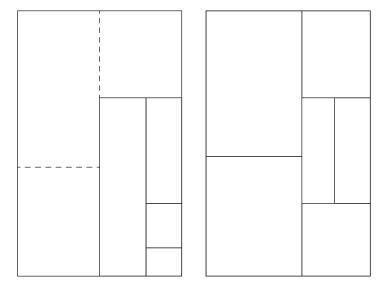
A blueprint of the ground (left) and first floor (right) of a terraced house without layout
